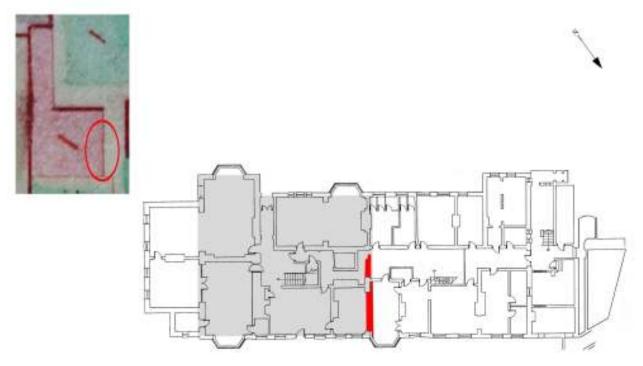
Plan of the modern house, showing the location of the original western wall uncovered in the dining room and spine corridor; alongside the 1771 Plan with the western wall circled.
